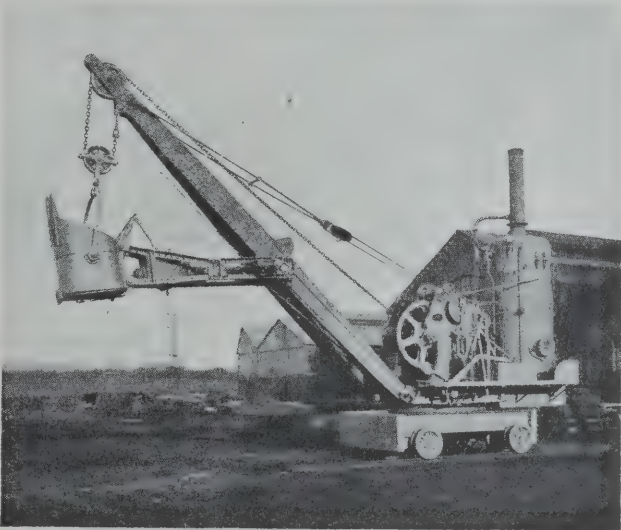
WILSON STEAM CRANE "JUBILEE" EXCAVATOR.
